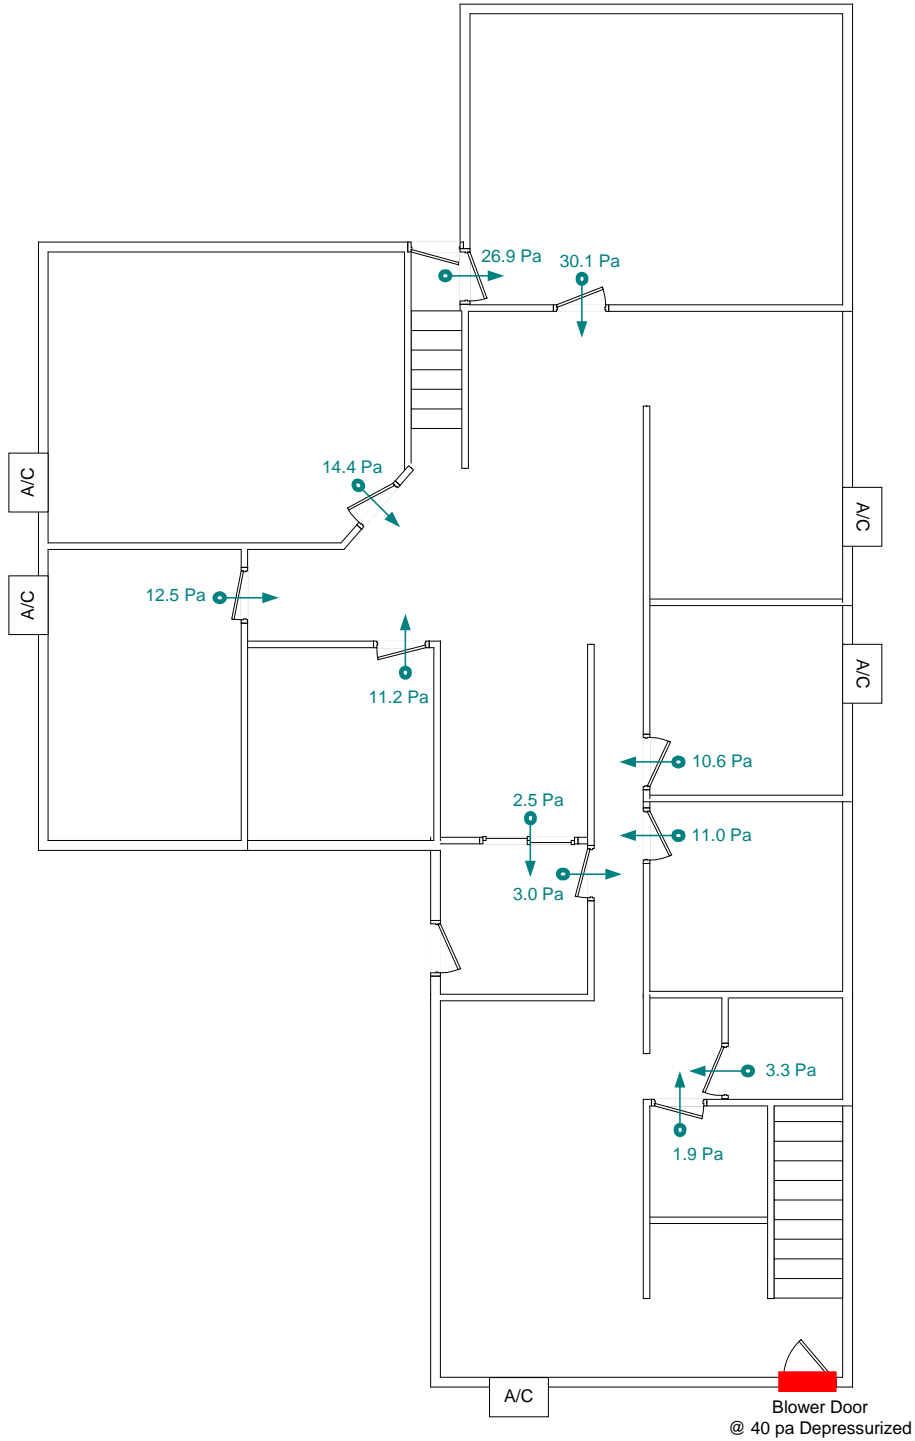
Test 7 Office & Apartment – Blower Door Test Results
